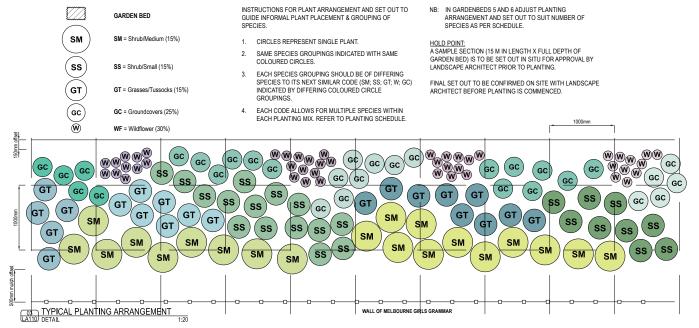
Typical planting arrangement proposed by the landscape architects for implementation across the entire Clowes Street biodiversity planting site.
